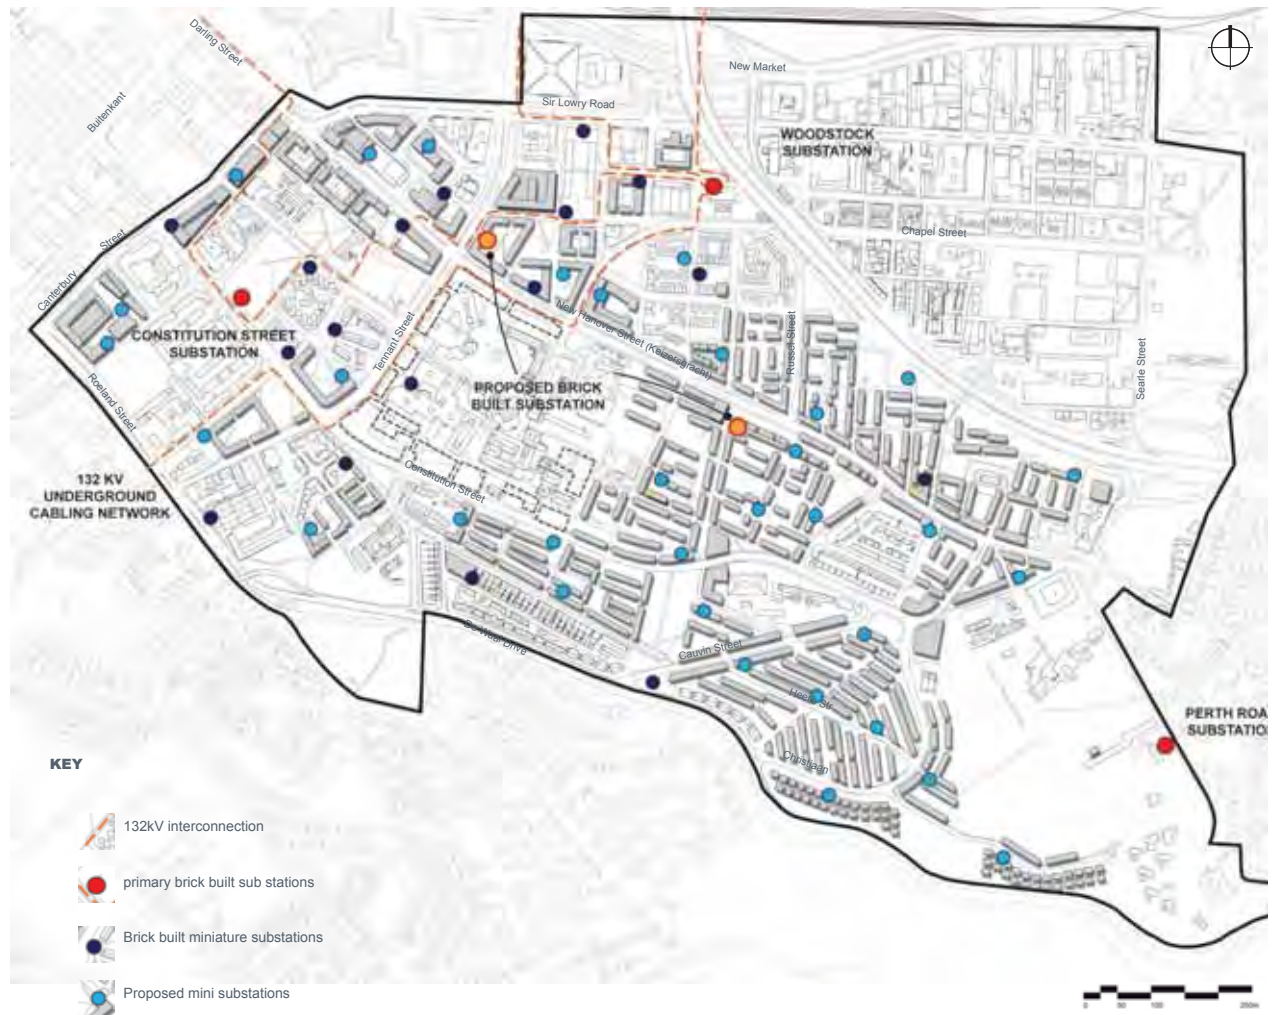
PLAN SHOWING EXISTING AND PROPOSED SUB STATIONS
